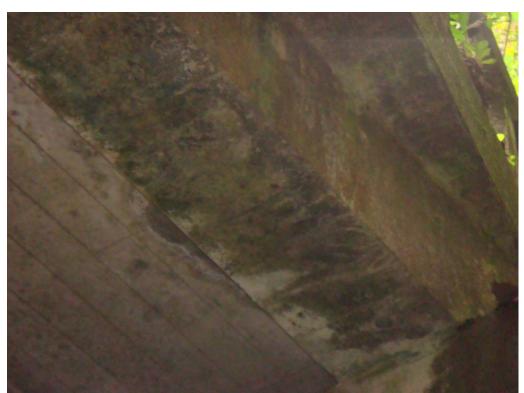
SMALL SPALL WITH EXPOSED REBAR IN BOTTOM OF GIRDER G1 NEAR HANA ABUTMENT
